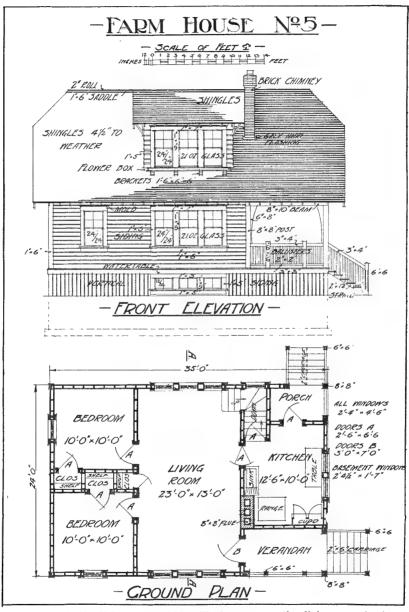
The living-room, which will also serve as the dining-room, is the central feature of the house. It extends across the whole width and has large windows facing front and back.
